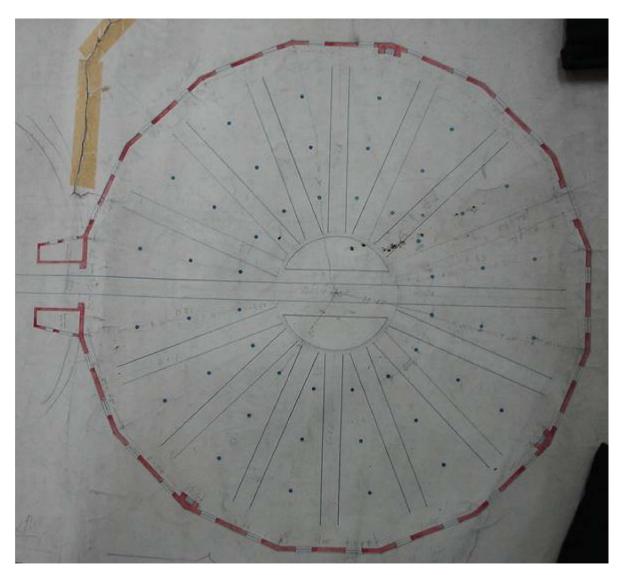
Plan of RH2, as built (NA RAIL 527.2369)
